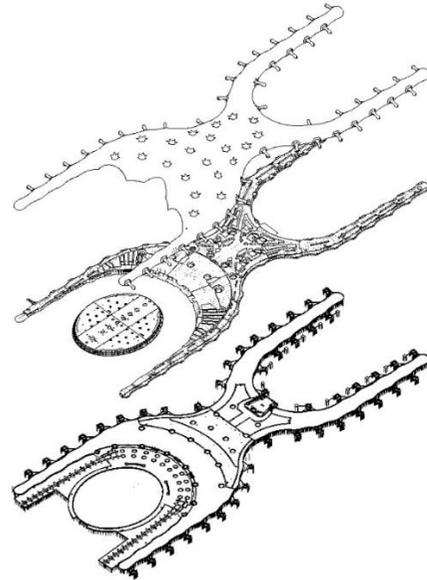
Exploded view of the terminal roof, over multiple building and civil structures, all on the continuous raft campus foundation
